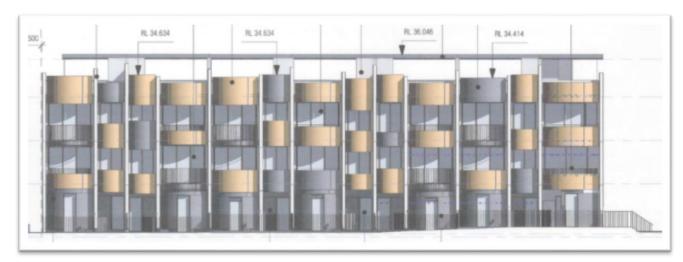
North elevation of North townhouses (viewed from Paper Square Park)
